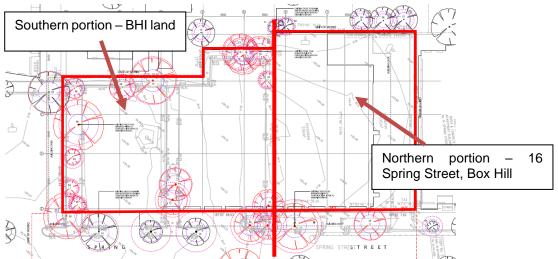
Survey Plan – existing vegetation on site and on surrounding properties
